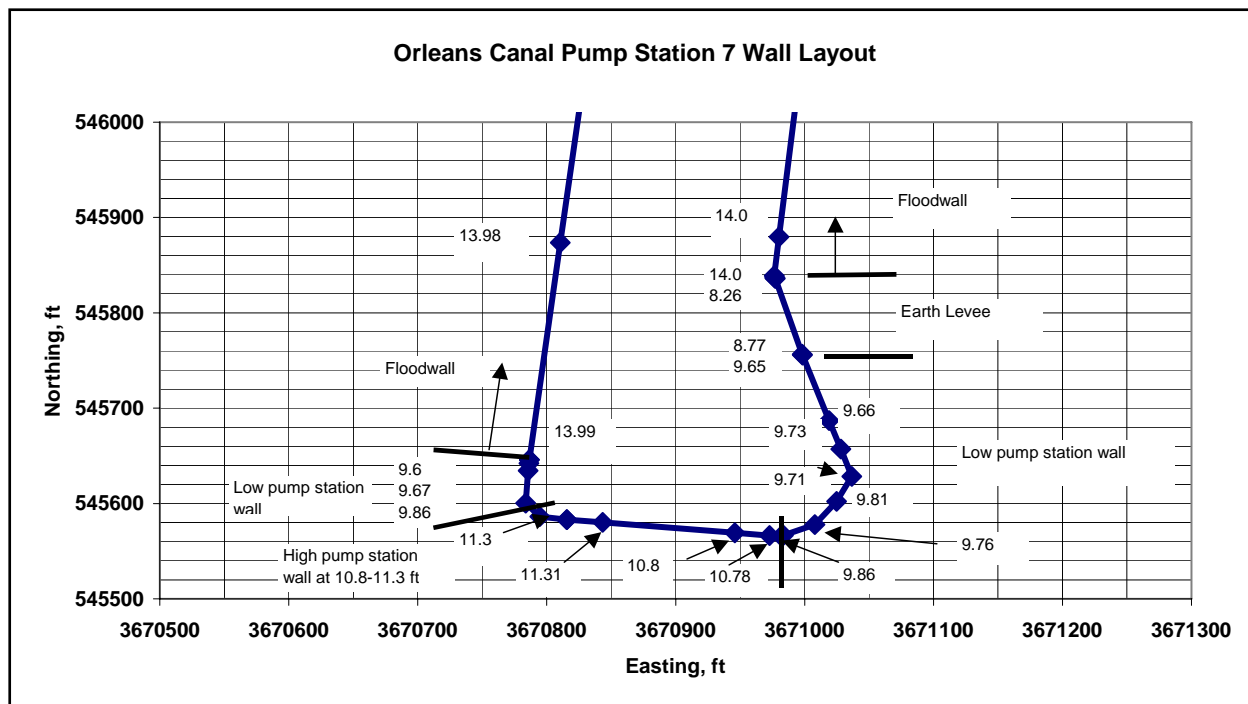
Floodwall, levee, and pump station wall elevations at OP#7.
